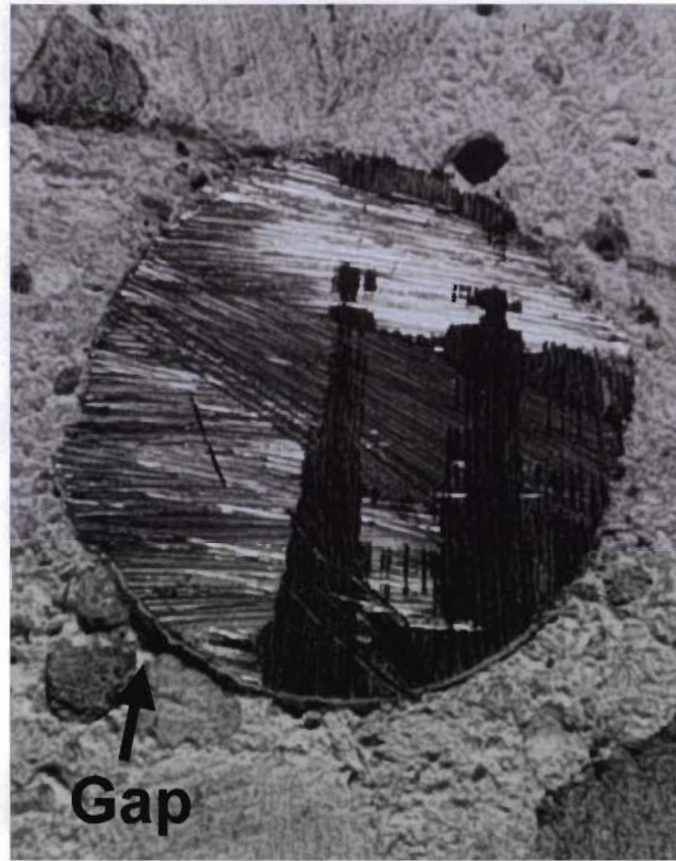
Gap between bar and concrete underneath epoxy-coated bar.
